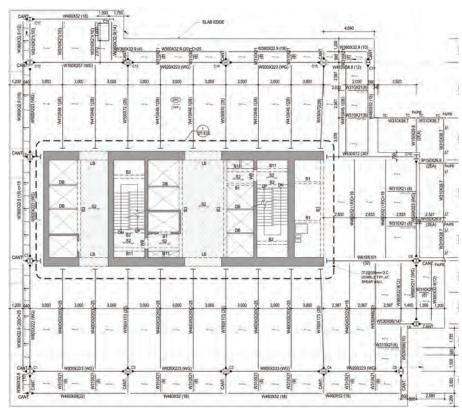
Typical floor framing plan (Source: Thornton Tomasetti, Inc.) 图5. 典型楼层构架平面图(来源:Thornton Tomasetti, Inc.)
